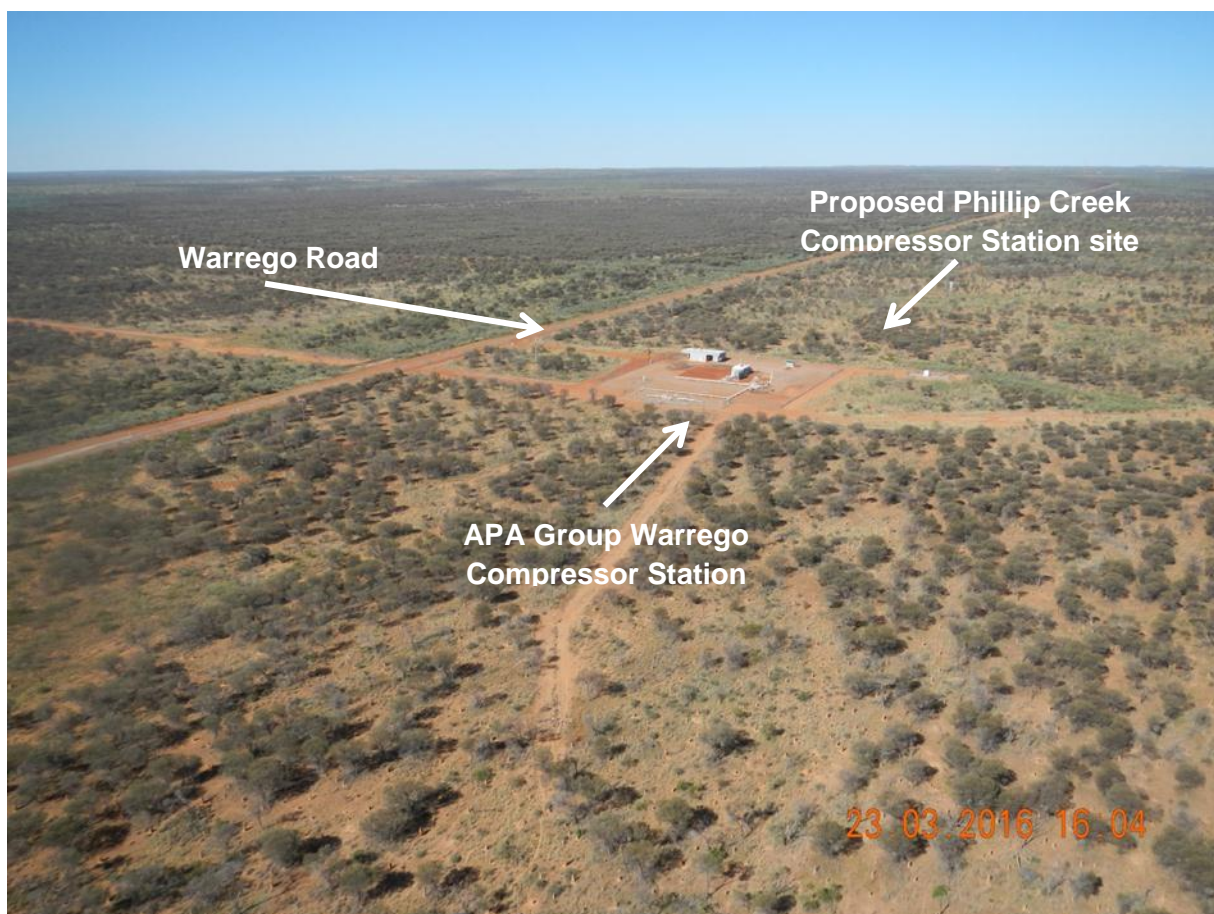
Photo of site for proposed Phillip Creek Compressor Station
